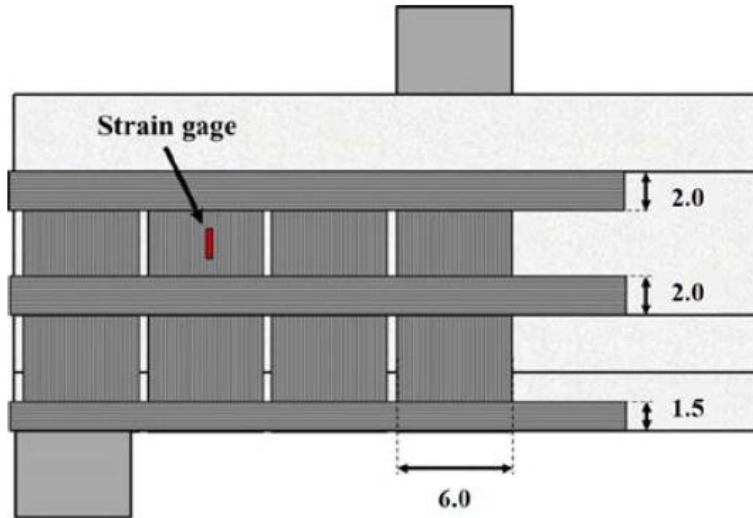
Longitudinal FRP Strip Anchorage Detailing for Half-Scale Specimens (from Andrawes et al. 2018)
